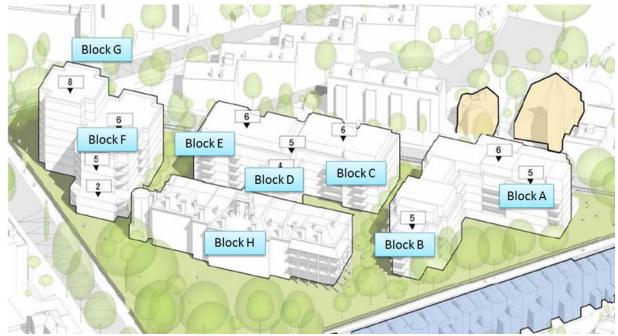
The massing of the scheme showing building heights. The proposed 3 new buildings are internally subdivided into 7 sub-blocks (A-G) reflecting the stair and lift cores to the 3 new buildings.
